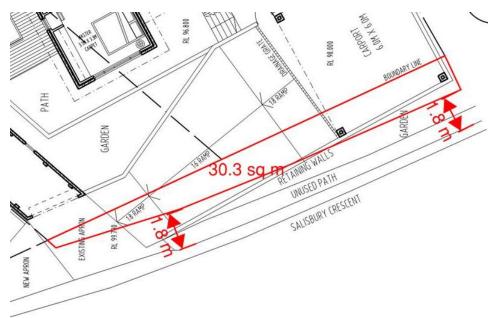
Diagram of Total Area Proposed to be Closed as a Highway
